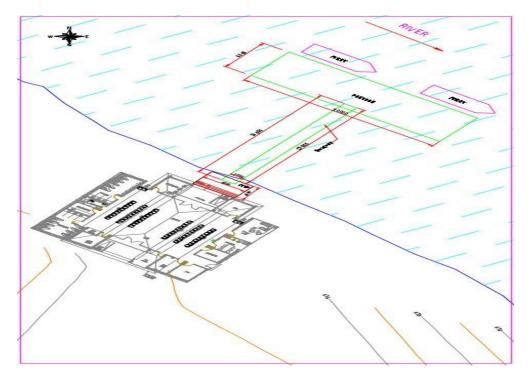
Overall site plan of proposed ferry terminal (T2) at Beeramballi.
